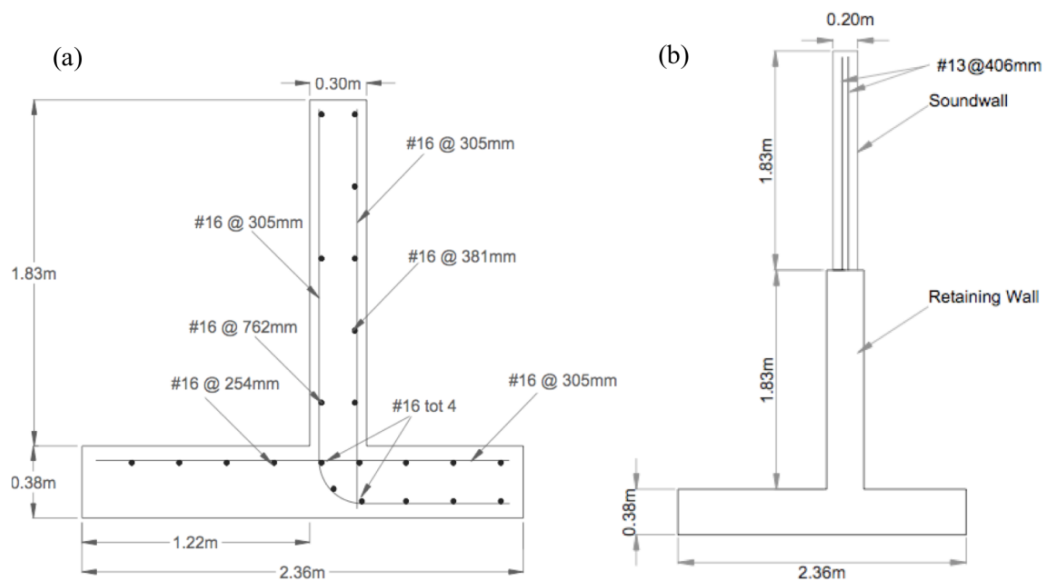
Cross-section of retaining wall: (a) without sound wall; and (b) with sound wall
